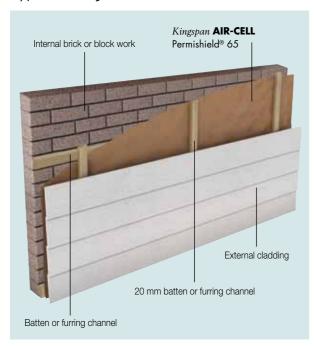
Kingspan AIR-CELL Permishield® 65 in reverse brick veneer wall installation
